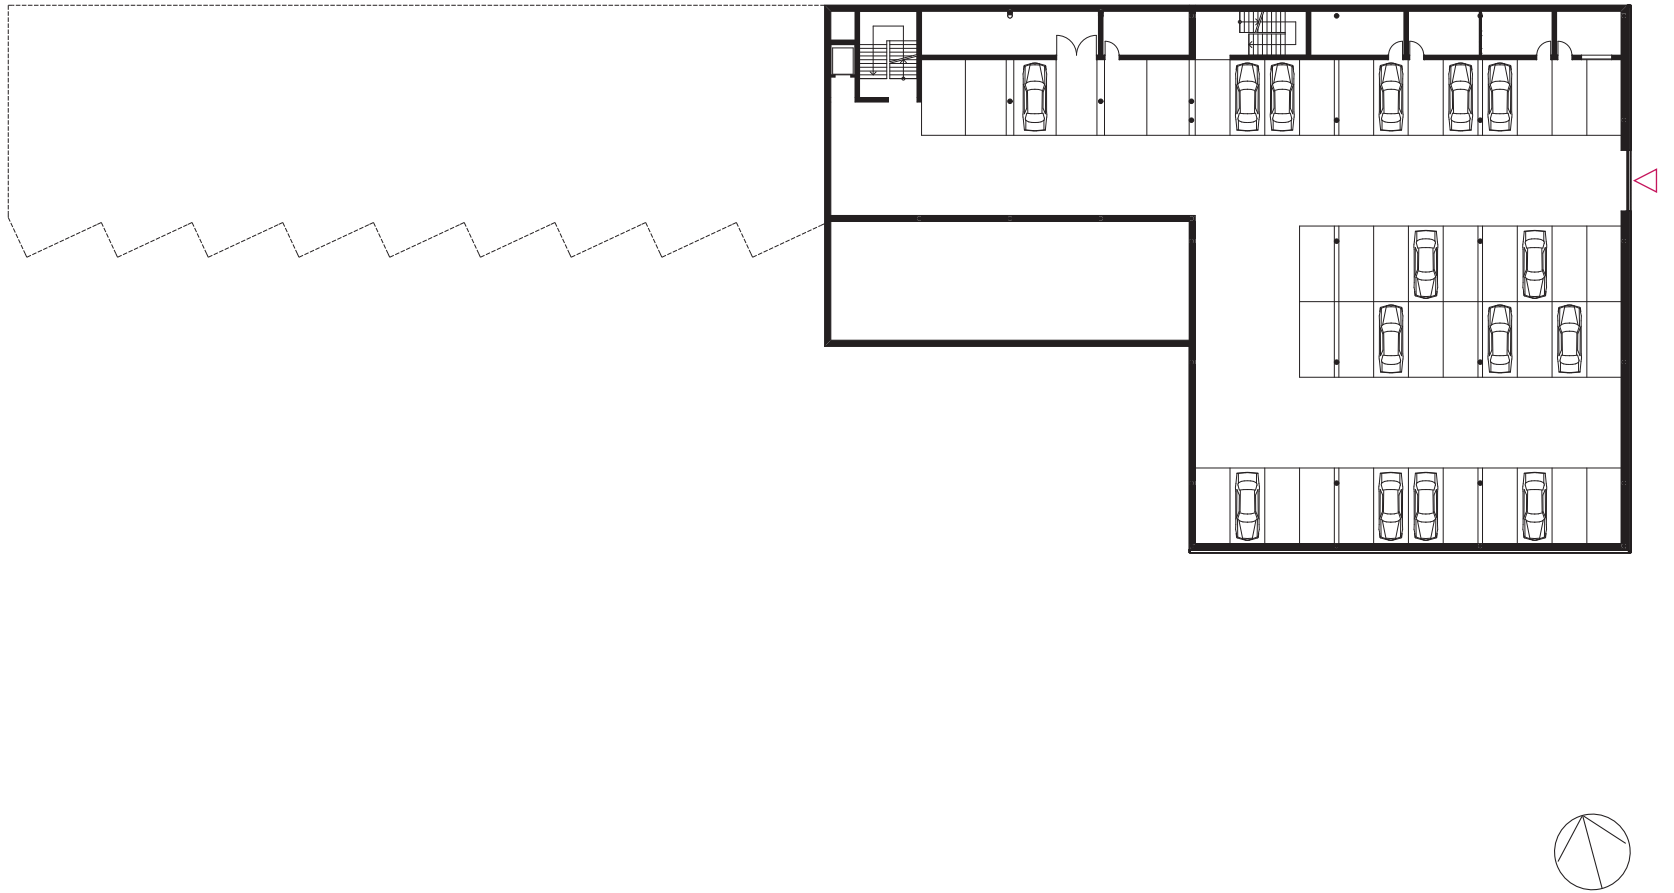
Underground floor plan of the New Generation Office Building (Scale 1:500)
